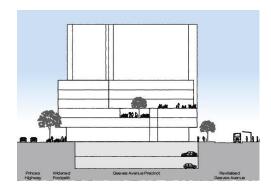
East-west section, looking south near the bus stops on Geeves Avenue
